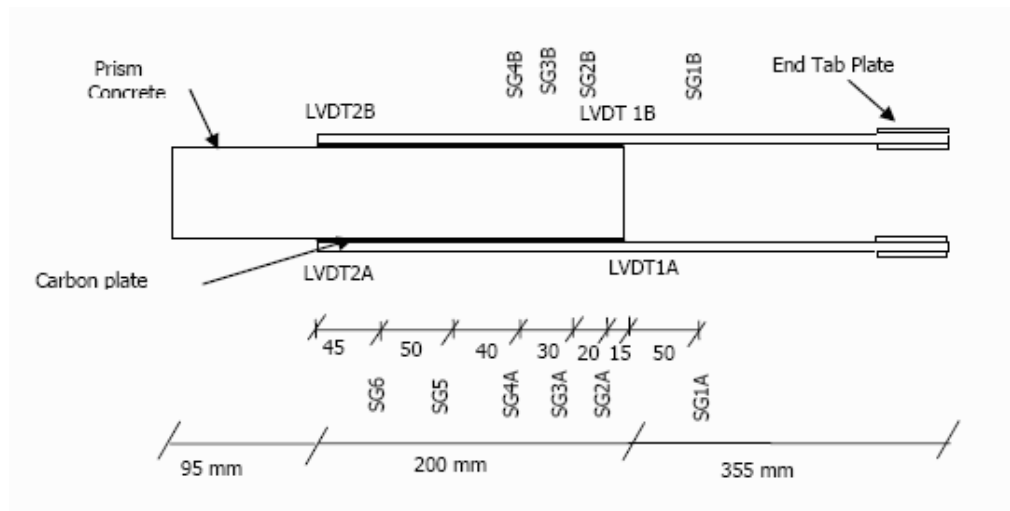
Dimension and instrumentation arrangement (AbuHassan, 2006)
